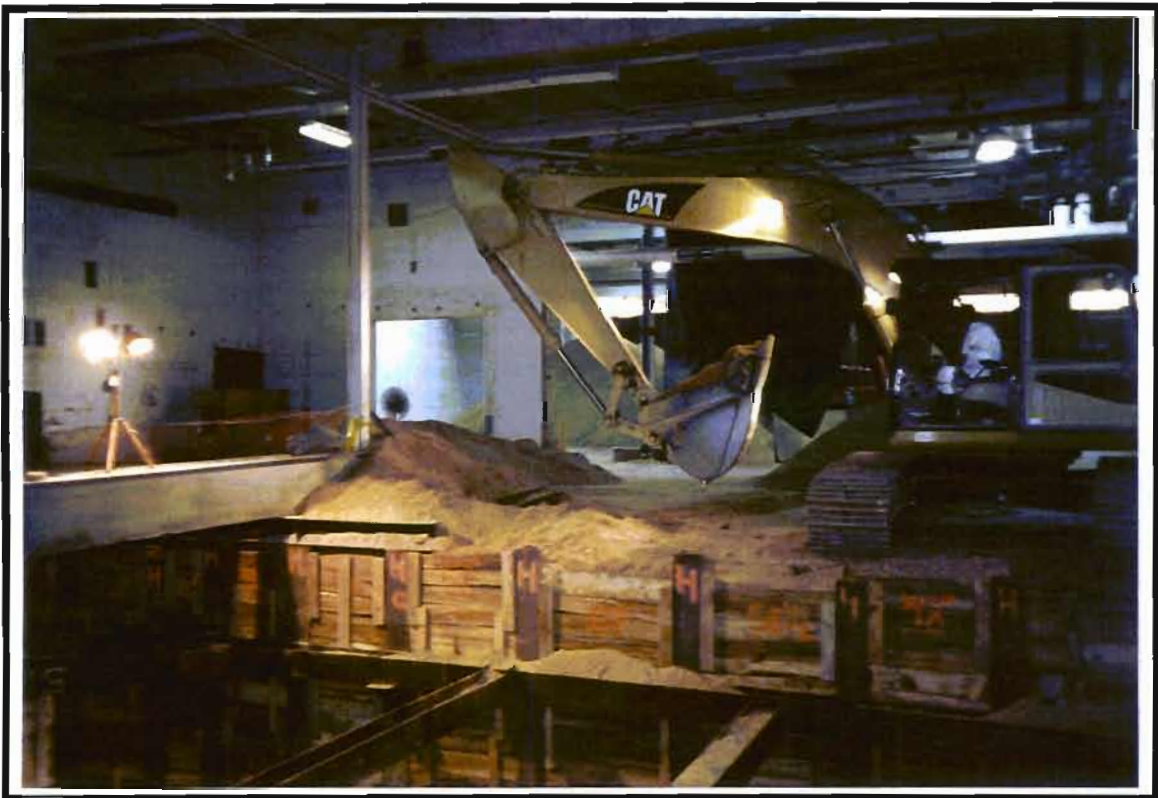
Hydraulic Excavator removing soil from excavation pit.
